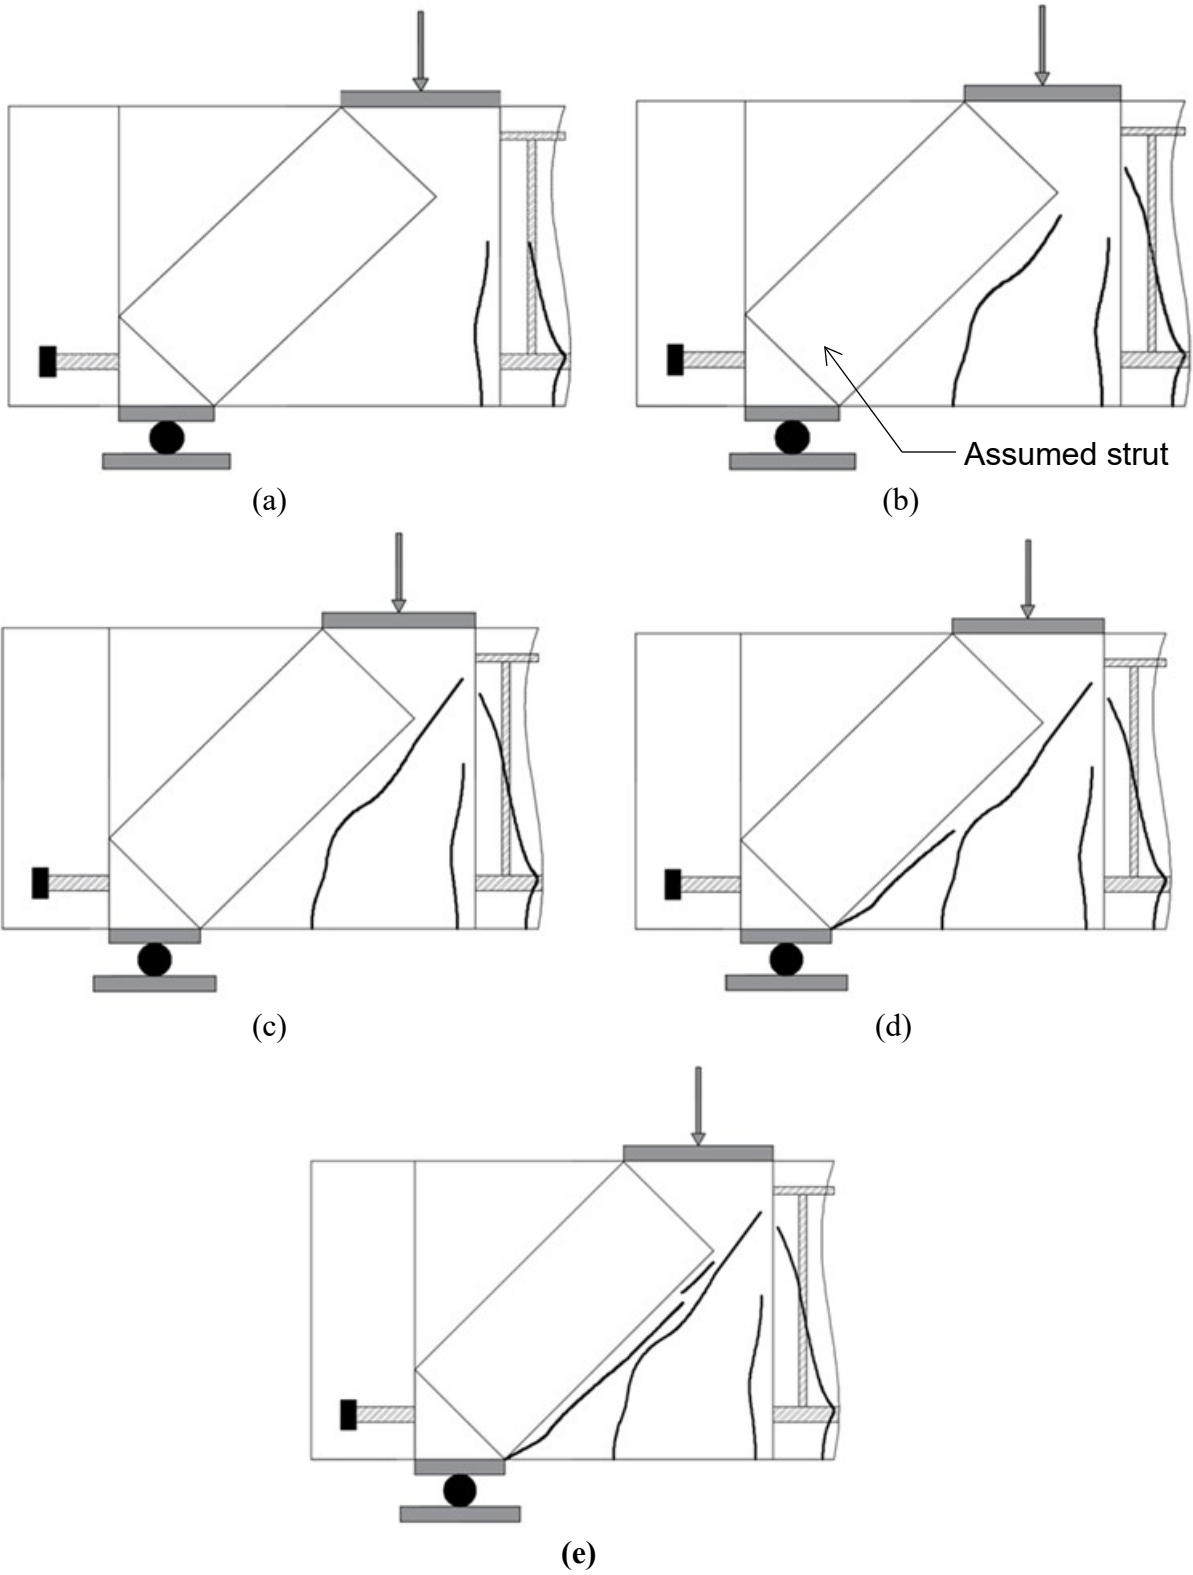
Observed crack growth in specimen with longitudinal bar anchored with a head.
